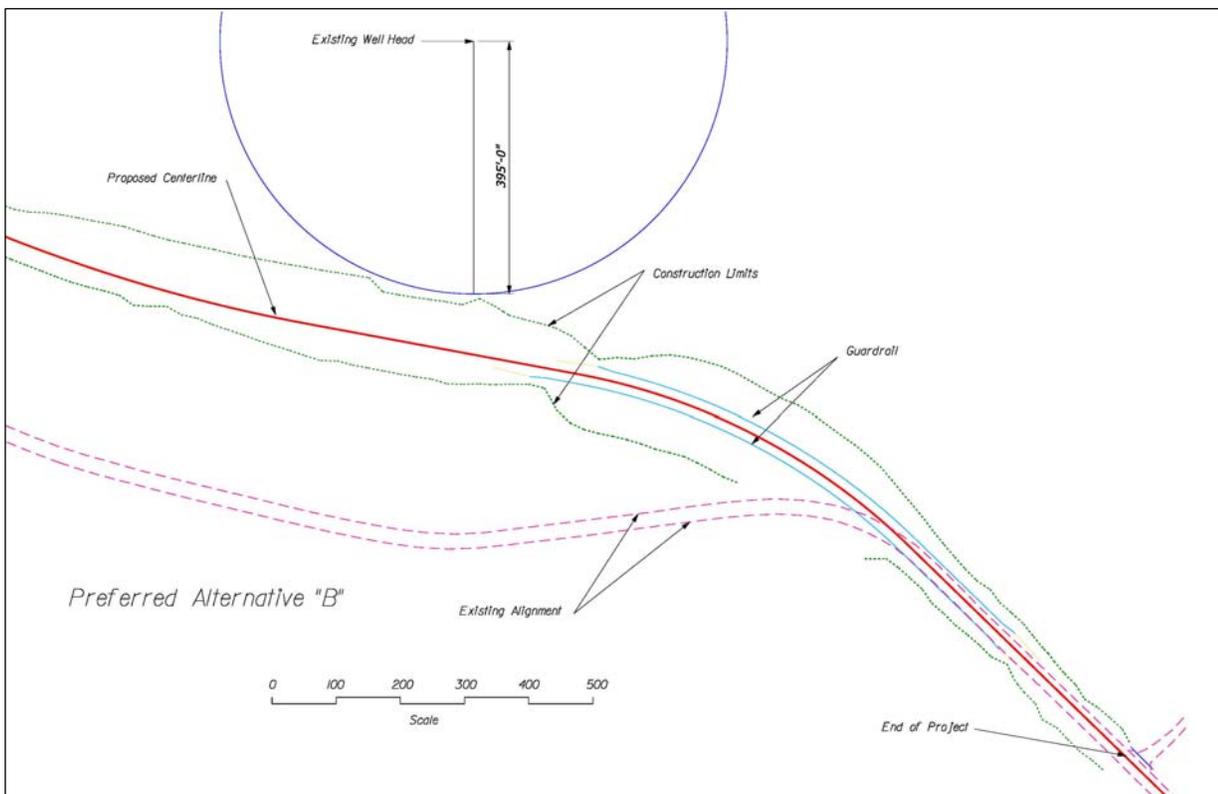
Alternative B alignment proximity to well 3 protection zone
